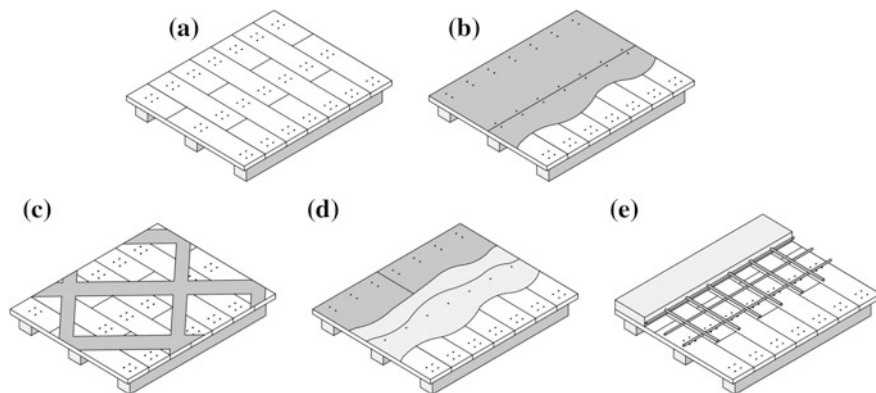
Different timber floor in-plane shear strengthening techniques: a existing simple layer of wood planks on the timber beams; b second layer of wood planks crossly arranged to the existing one and fixed by means of steel studs; c diagonal bracing of the existing wood planks by means of light steel plates or FRP laminate; d three layers of plywood panels glued onto the existing wood planks and e a stud-connected reinforced concrete slab. Adapted from Piazza et al. [87]
